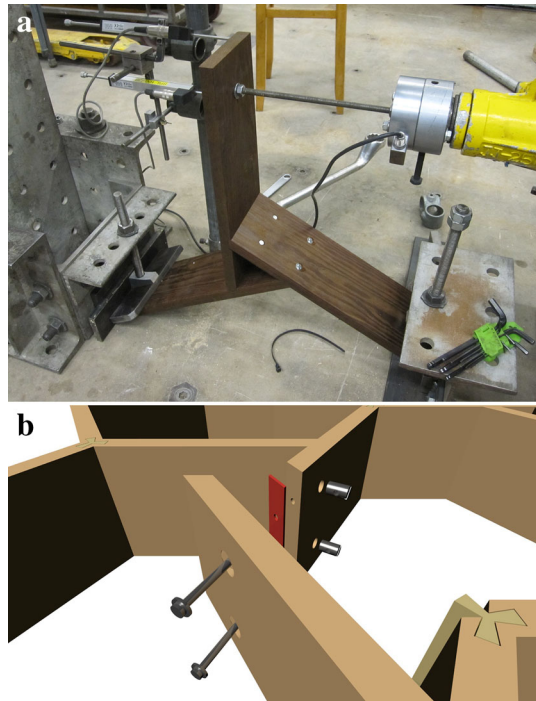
Kreod Pavilion, test assembly. Photo: courtesy Rambøll
